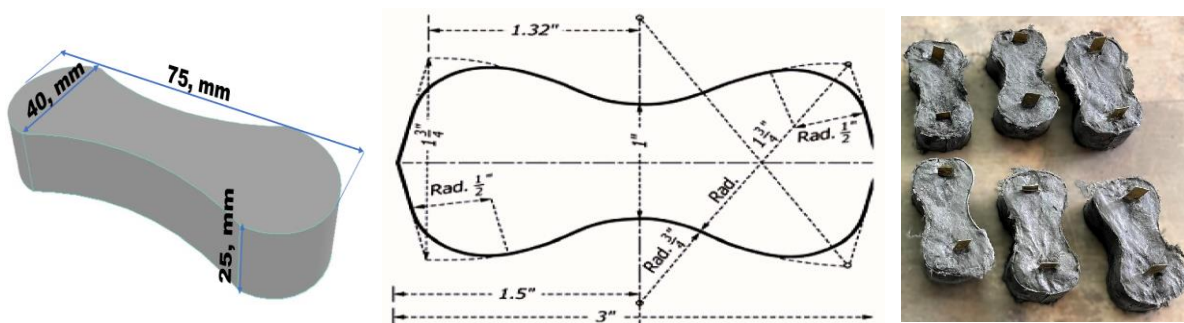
The geometric dimensions of the dog-bone specimens [33].
